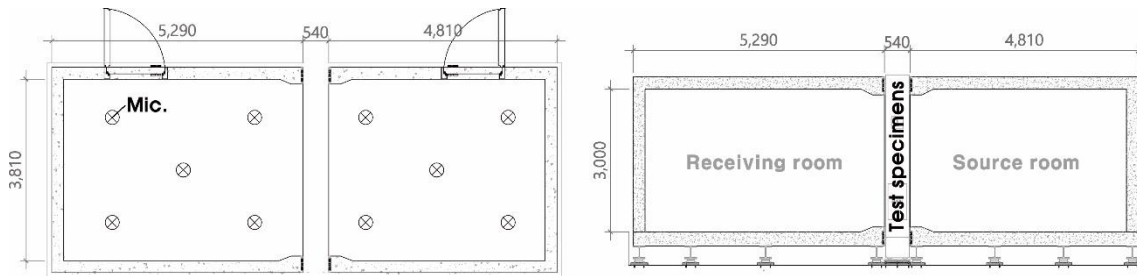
Configuration of test room (Left: Floor plan, Right: Vertical section)
